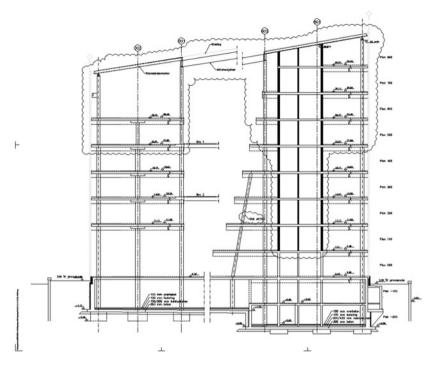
Plan pertaining to the load bearing 'skeleton' of the domicile
